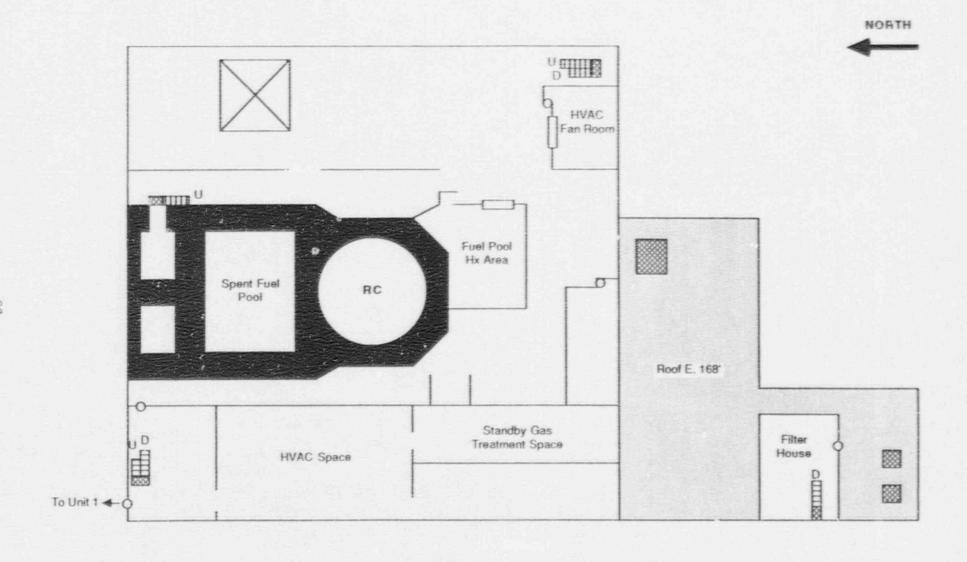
Hatch Unit 2 Reactor Building Arrangement - Elevation 185 ft.
